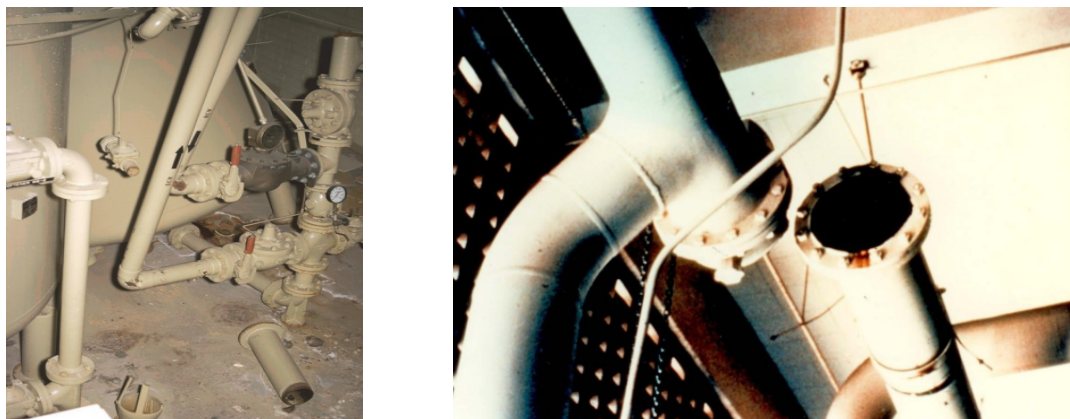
Pipework broken and pipe joint failure in 1971 San Fernando
